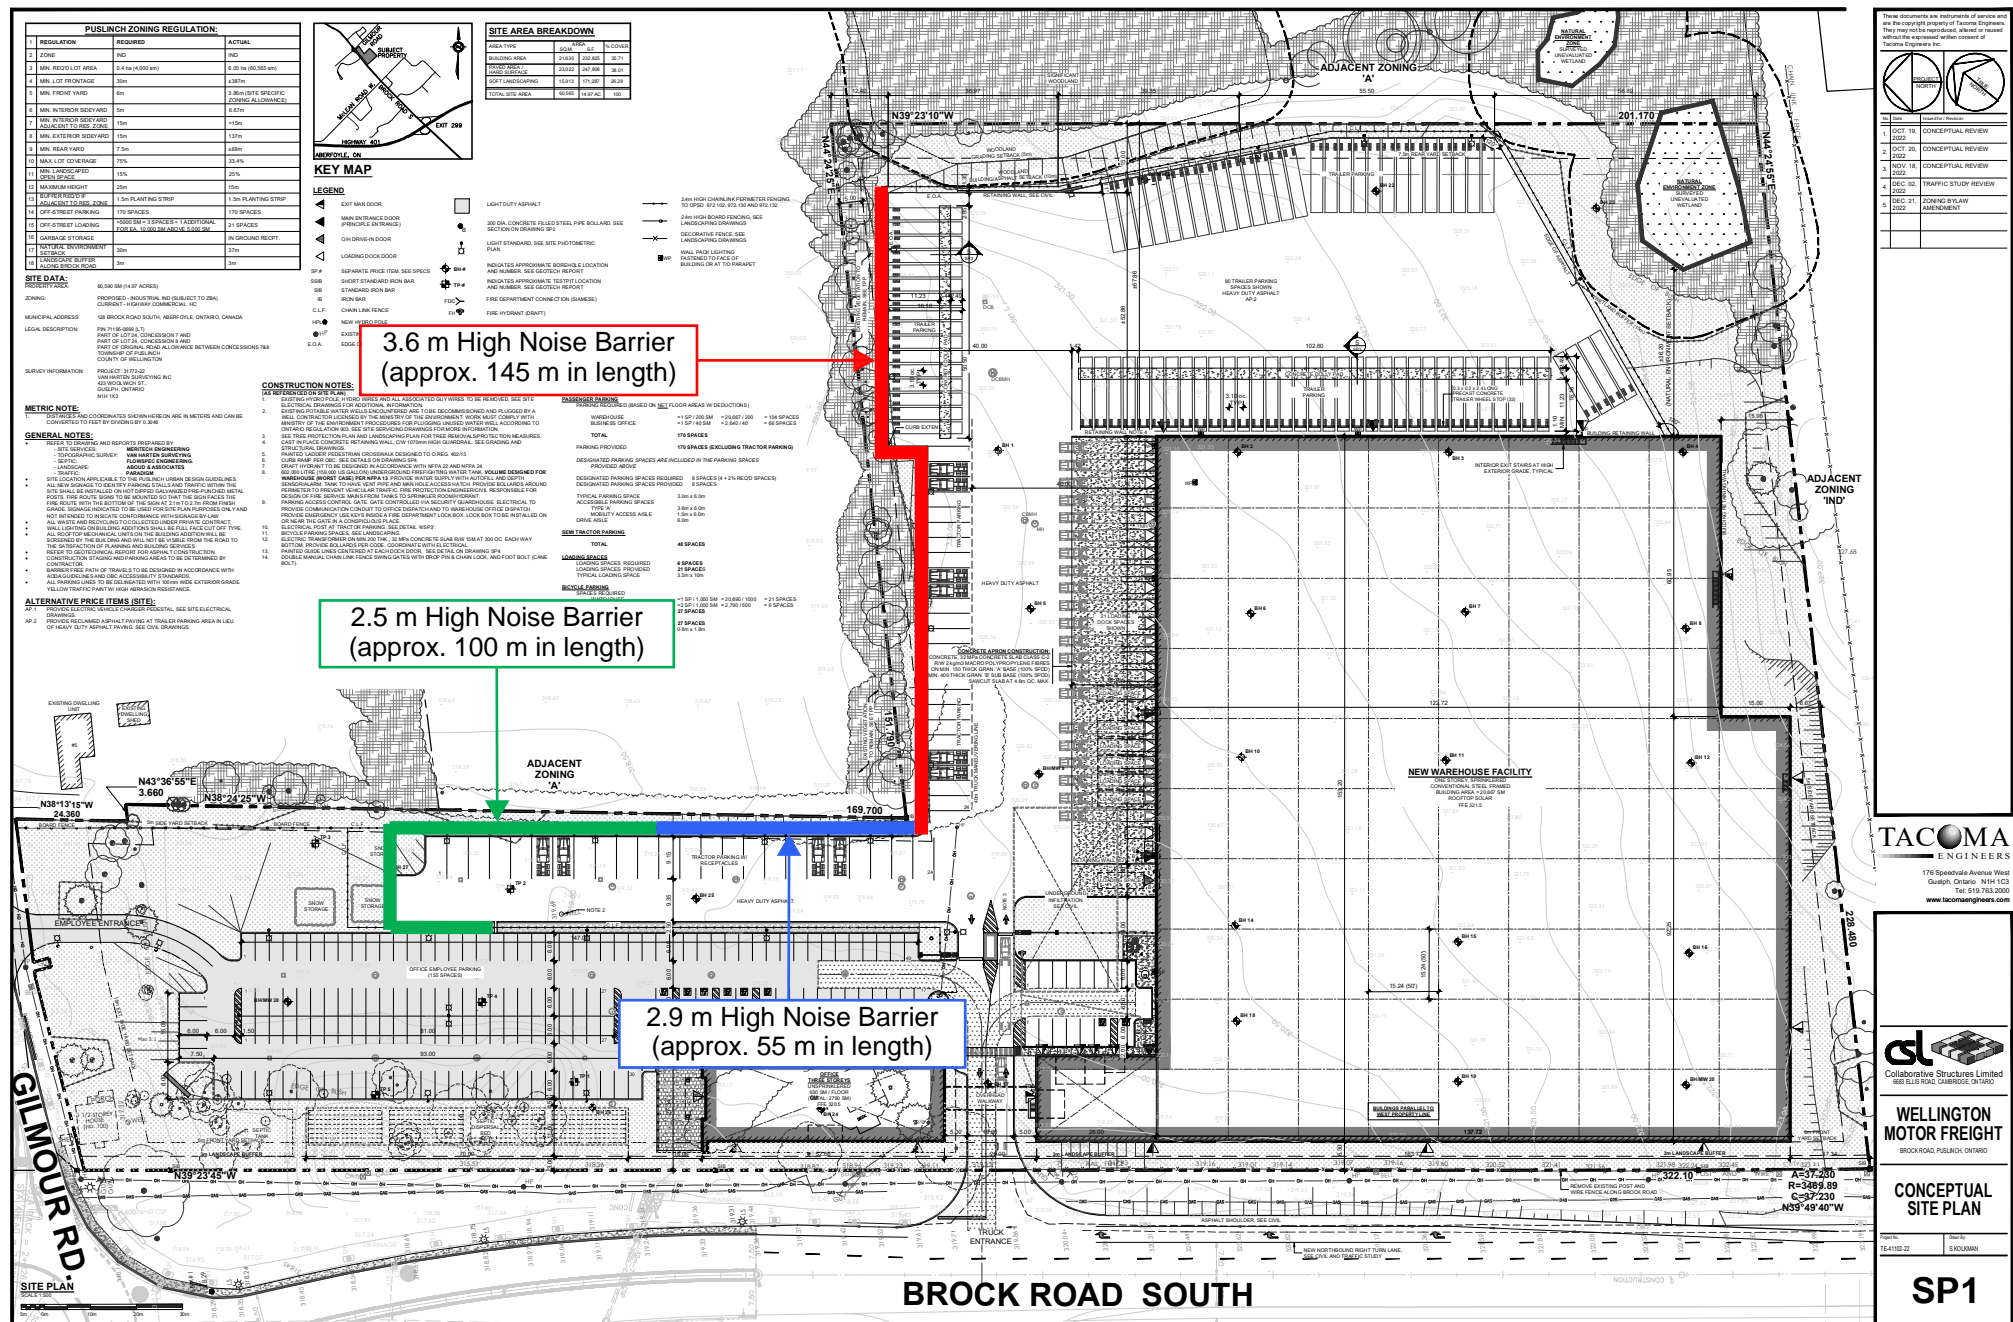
Proposed Site Plan Showing Noise Barrier Location
